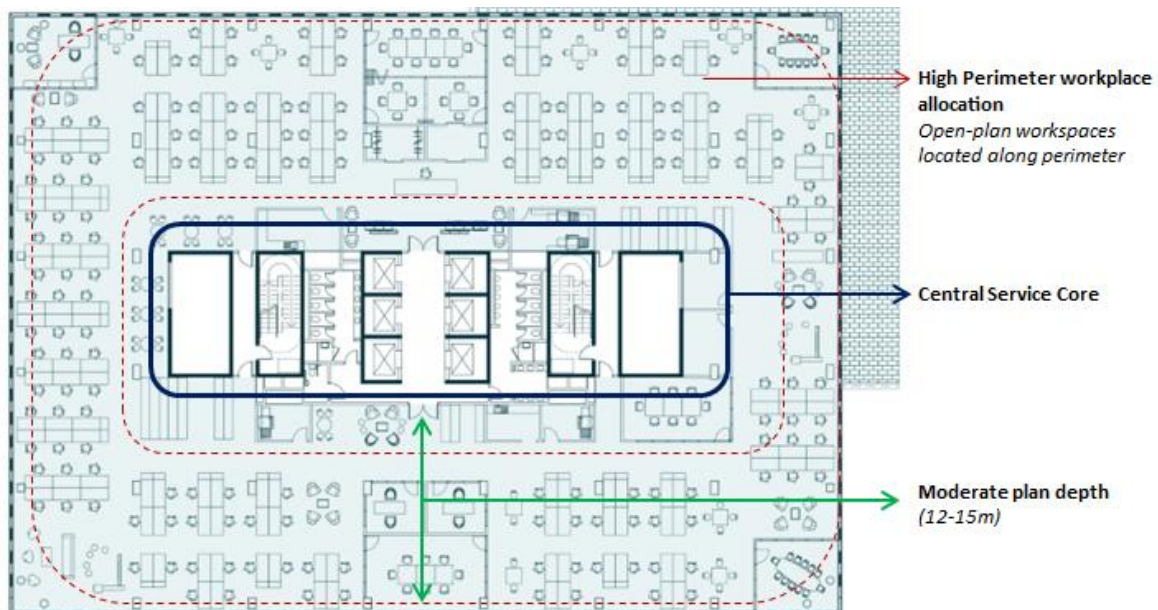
Typical floor plan of Heritage Place showing central service core and high perimeter workspace allocation.
